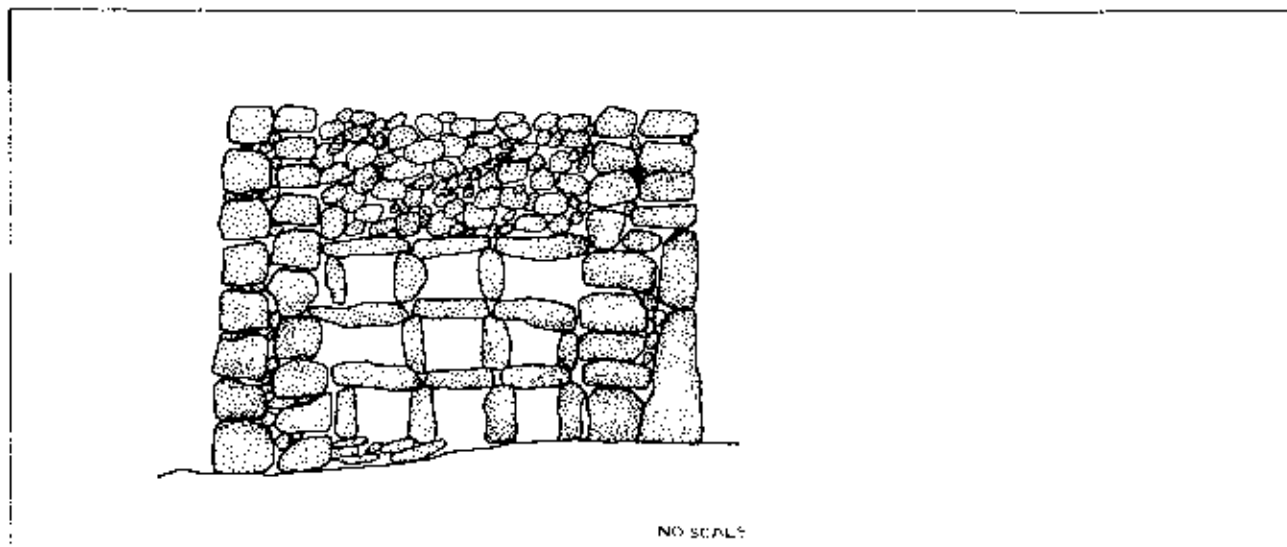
SCHEMATIC CROSS SECTION OF GREAT WALL OF PU'UHONUA, SHOWING OPEN PAO CONSTRUCTION.
